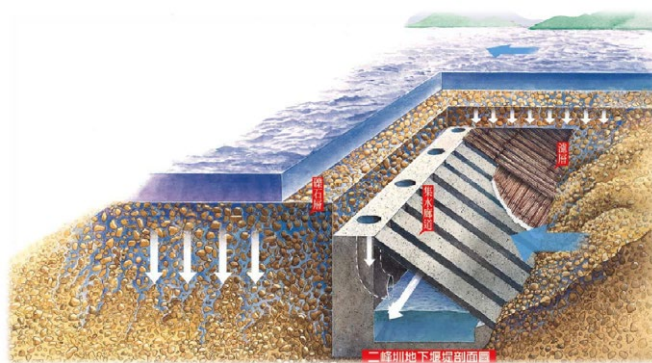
Cross-section of the trapezoidal weir, Er-Feng Irrigation Canal System (Photo Credit: Li-Ping Wu et al., 2004: 78-79).
